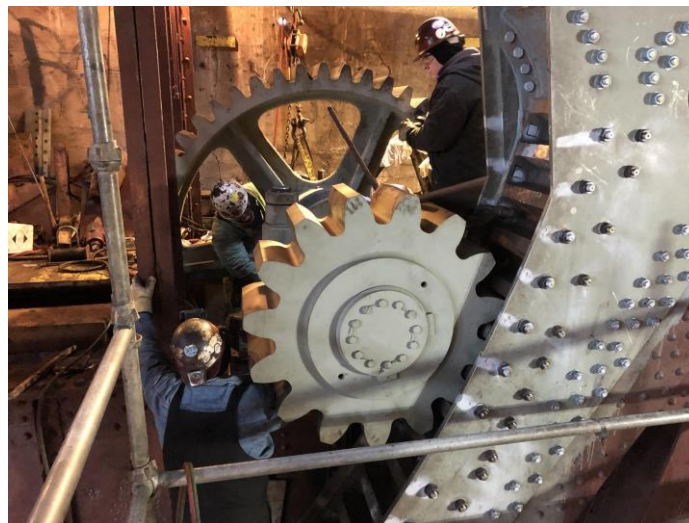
Completed repair with proper radial alignment. South assembly shown.
